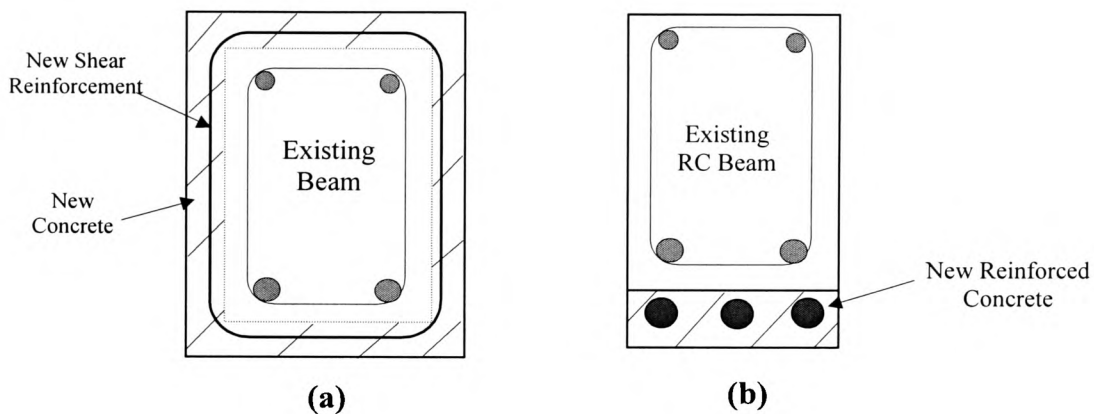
Traditional Strengthening Method by Adding Extra Reinforced Concrete
